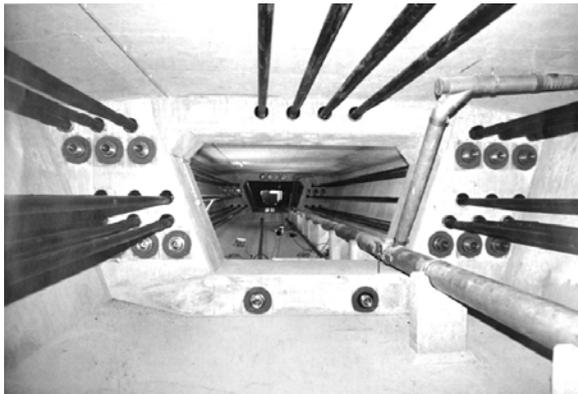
(b): Berbke Bridge, internal view. (SUSPA)
